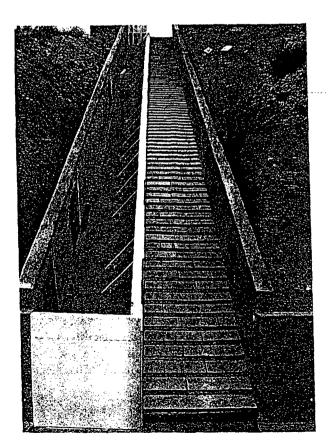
Fifty foot high flume facility used to test overlapping blocks for embankment dam protection.
